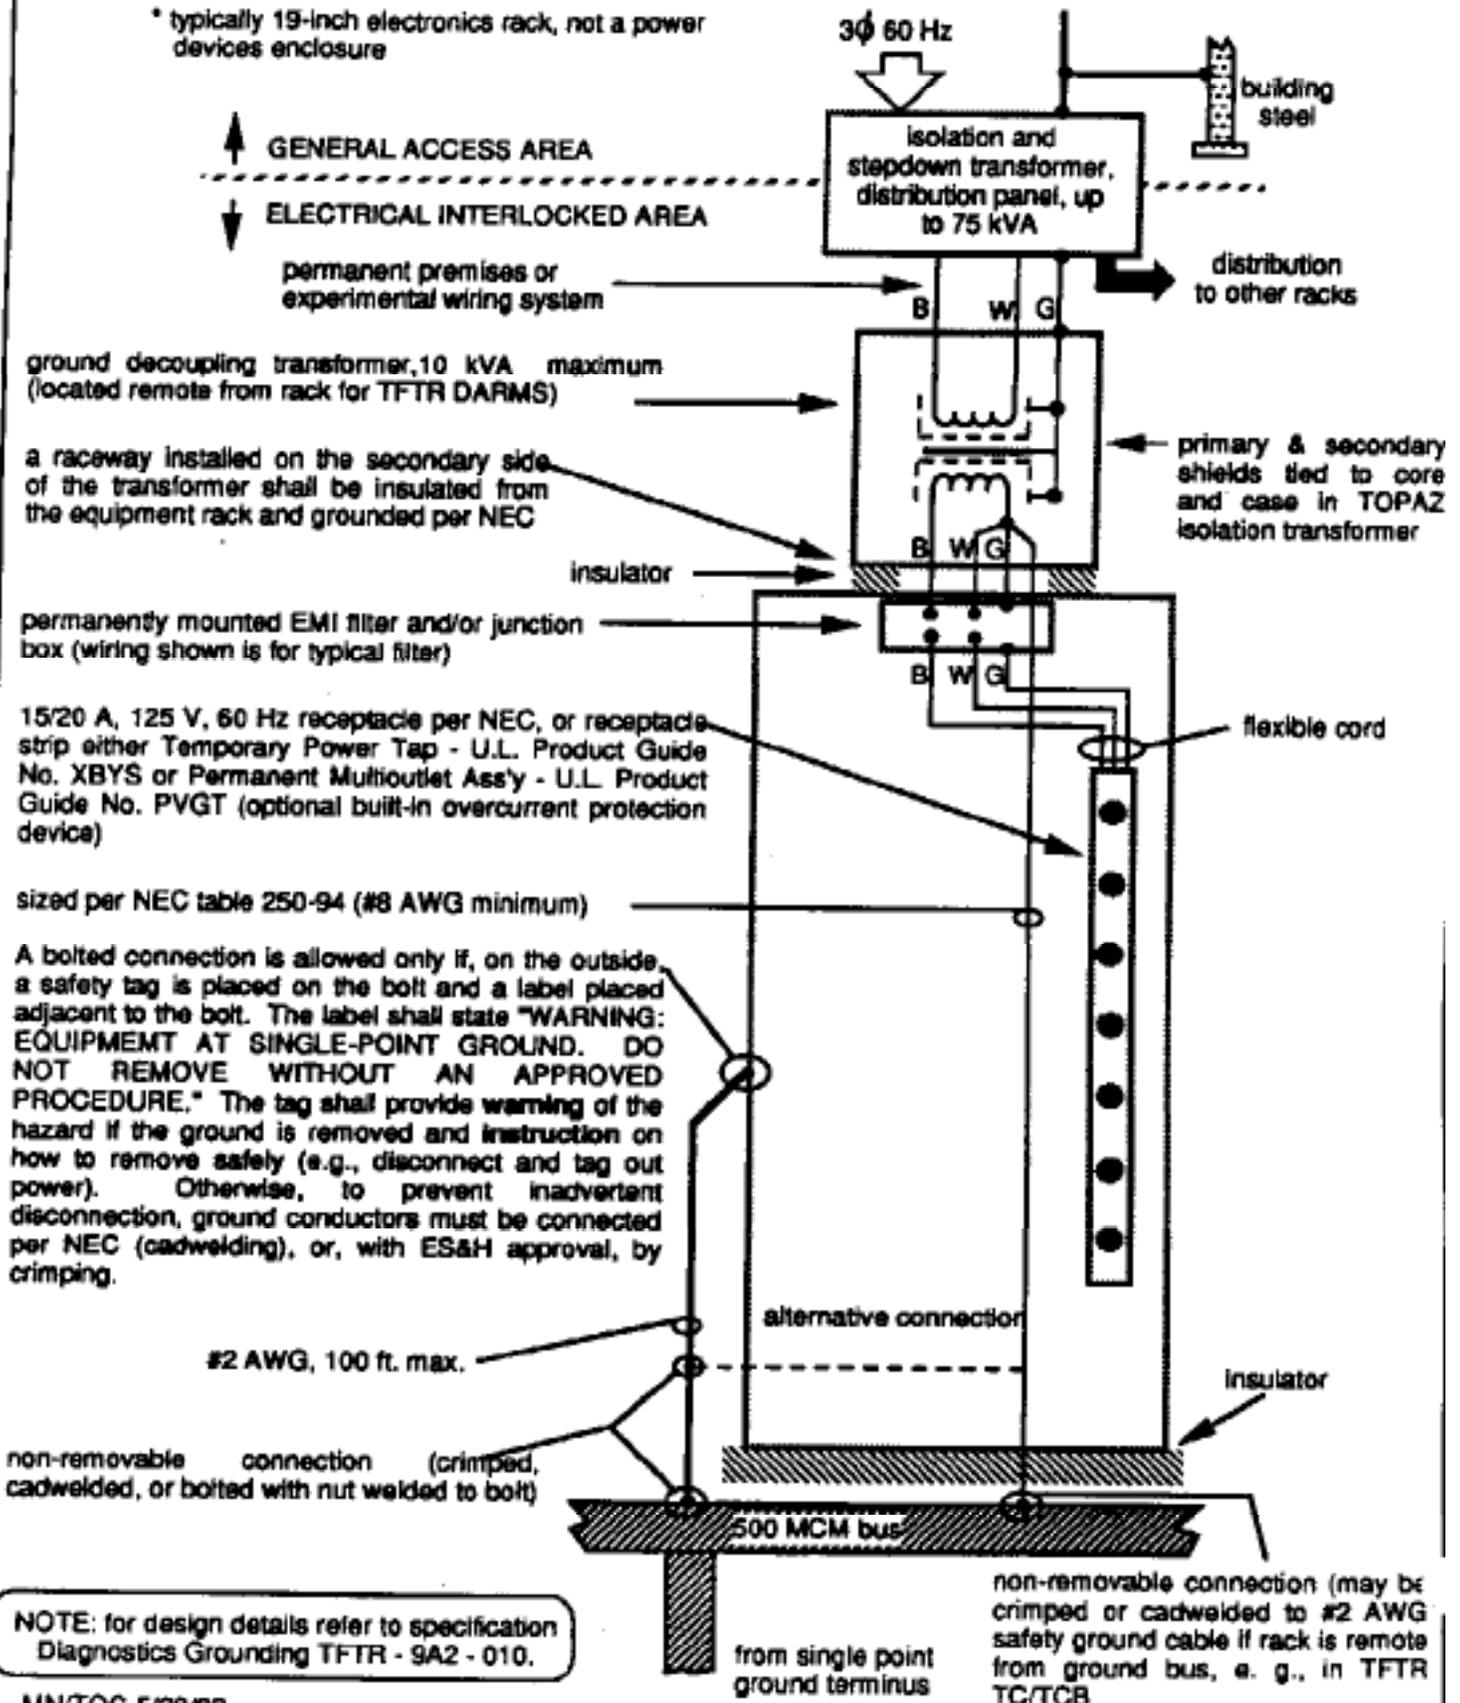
SINGLE POINT GROUNDED EQUIPMENT RACKS*, GROUNDING AND AC POWER CONNECTION, TYPICAL INSTALLATION
